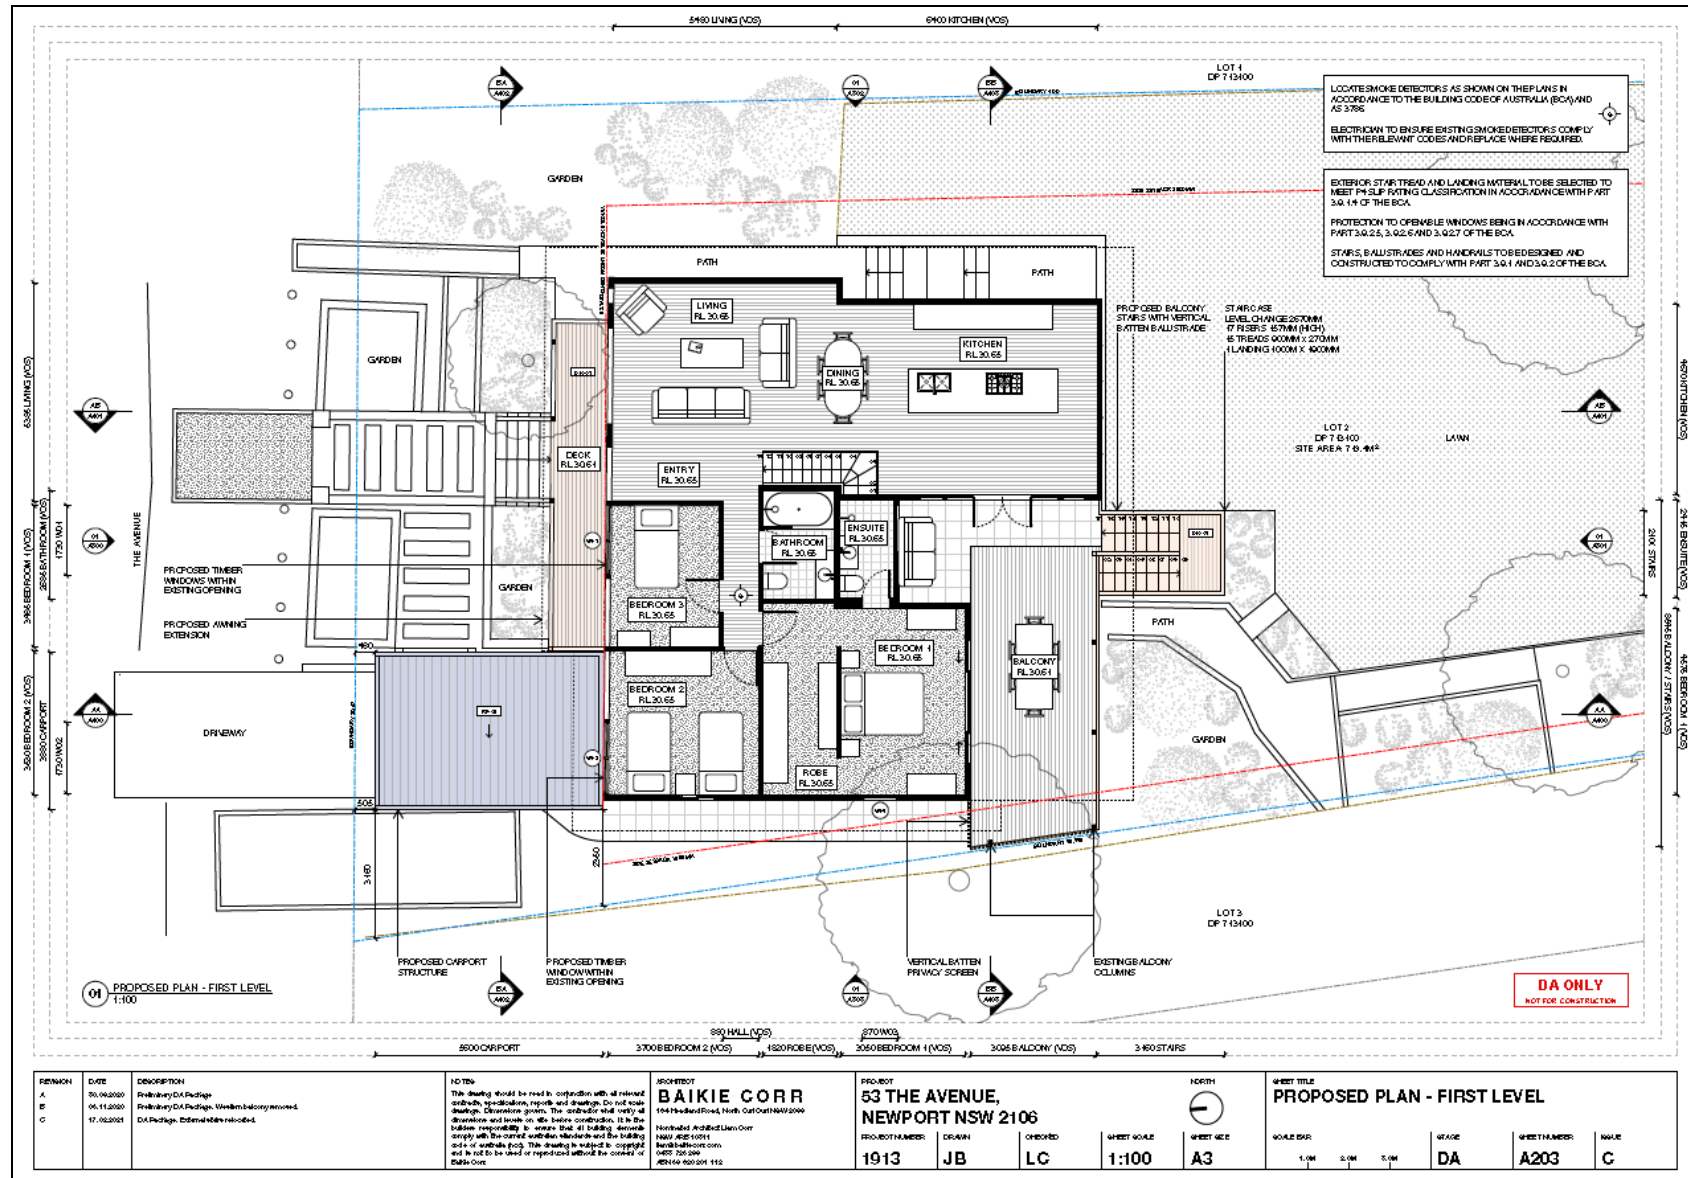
(Above & pages 11-14) Illustrates the proposed Plans, Elevations & Sections.
